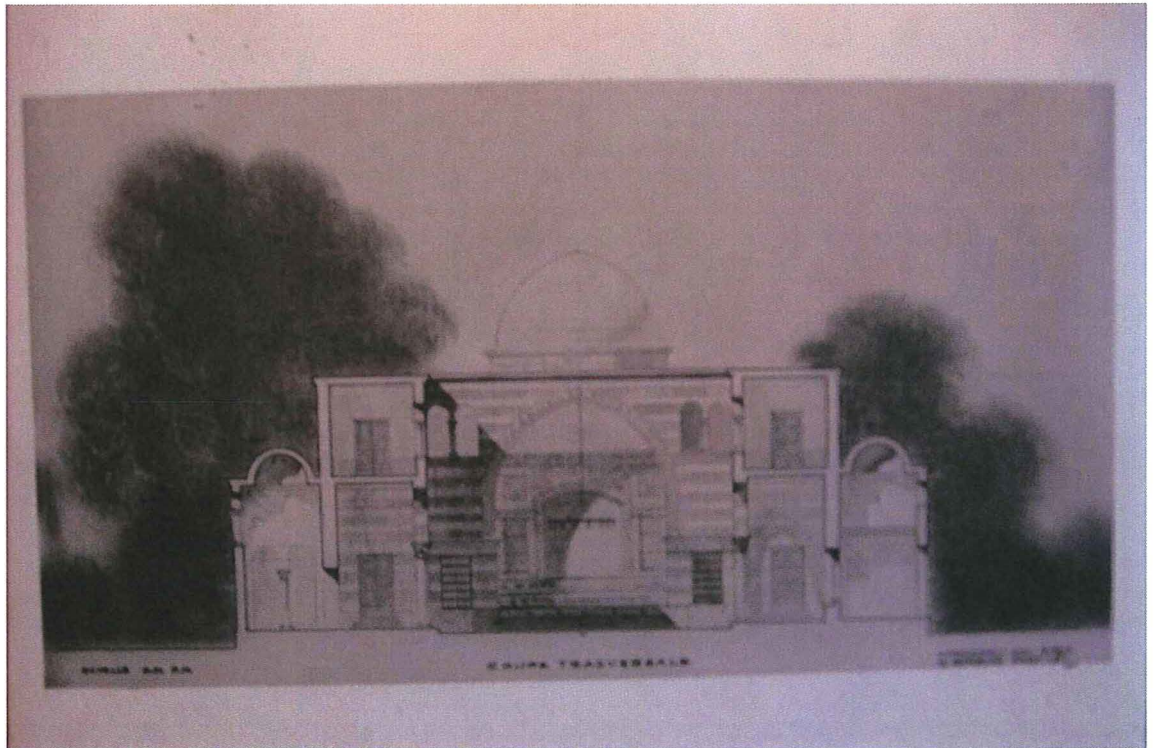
Syrian pavilion, an earlier sketch. (MAE, CAD)
